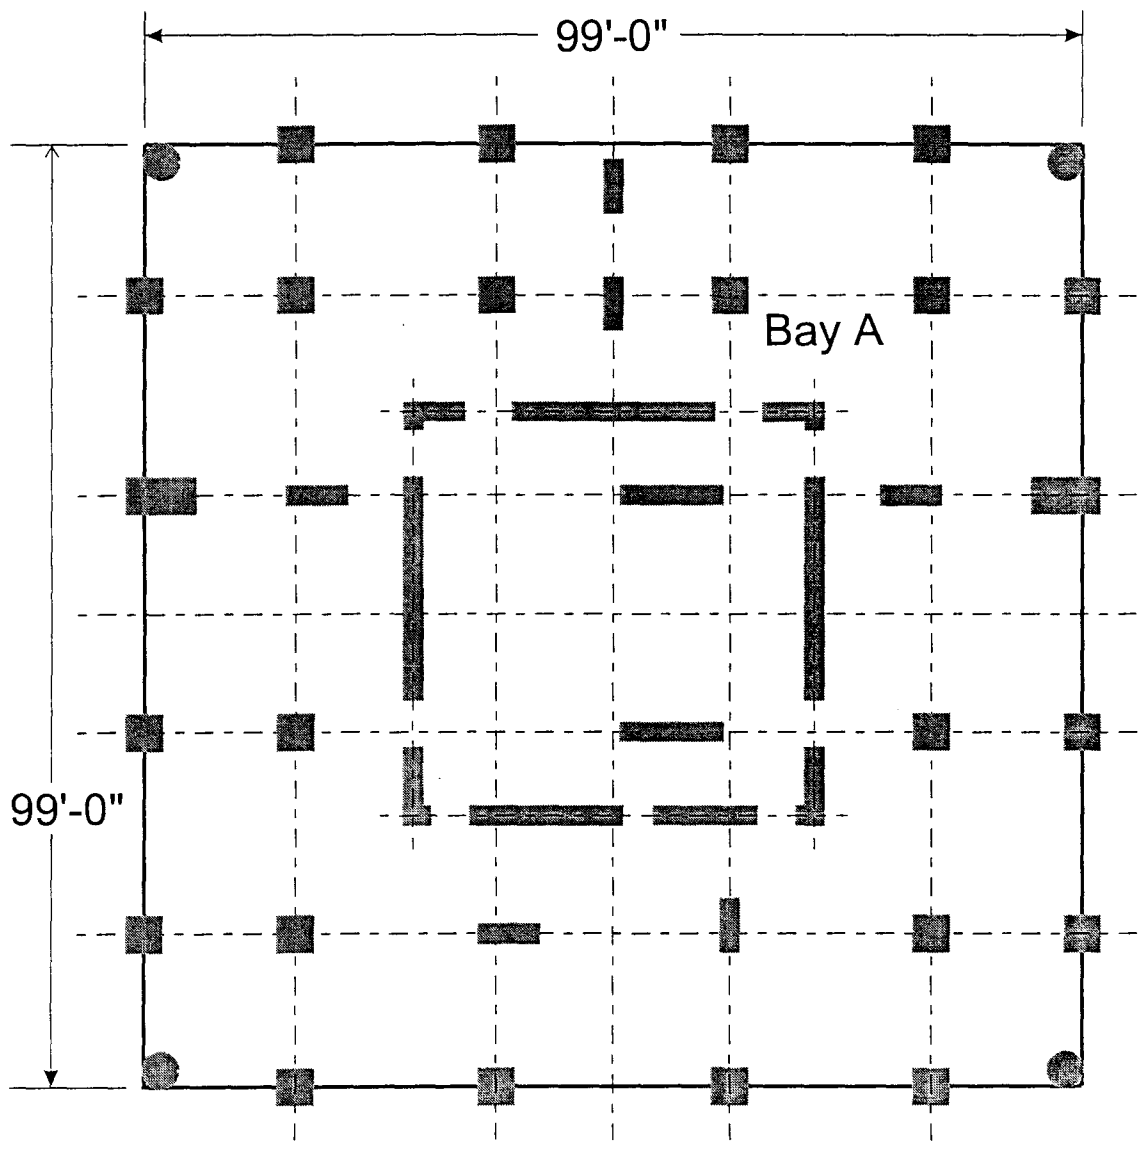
Floor plan at Boston Museum Towers and location of bay in which measurements were taken.
